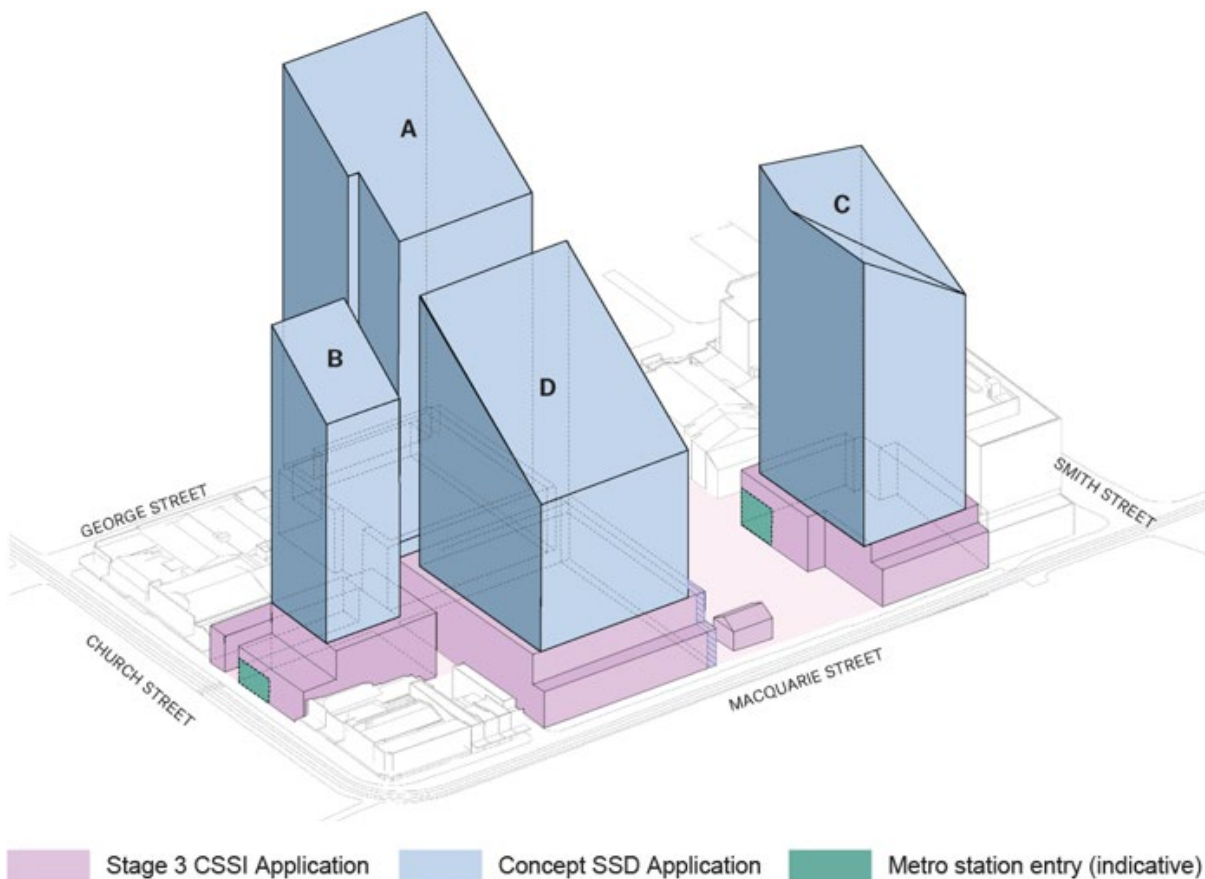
Proposed Building Envelopes – Isometric View (looking north east)
